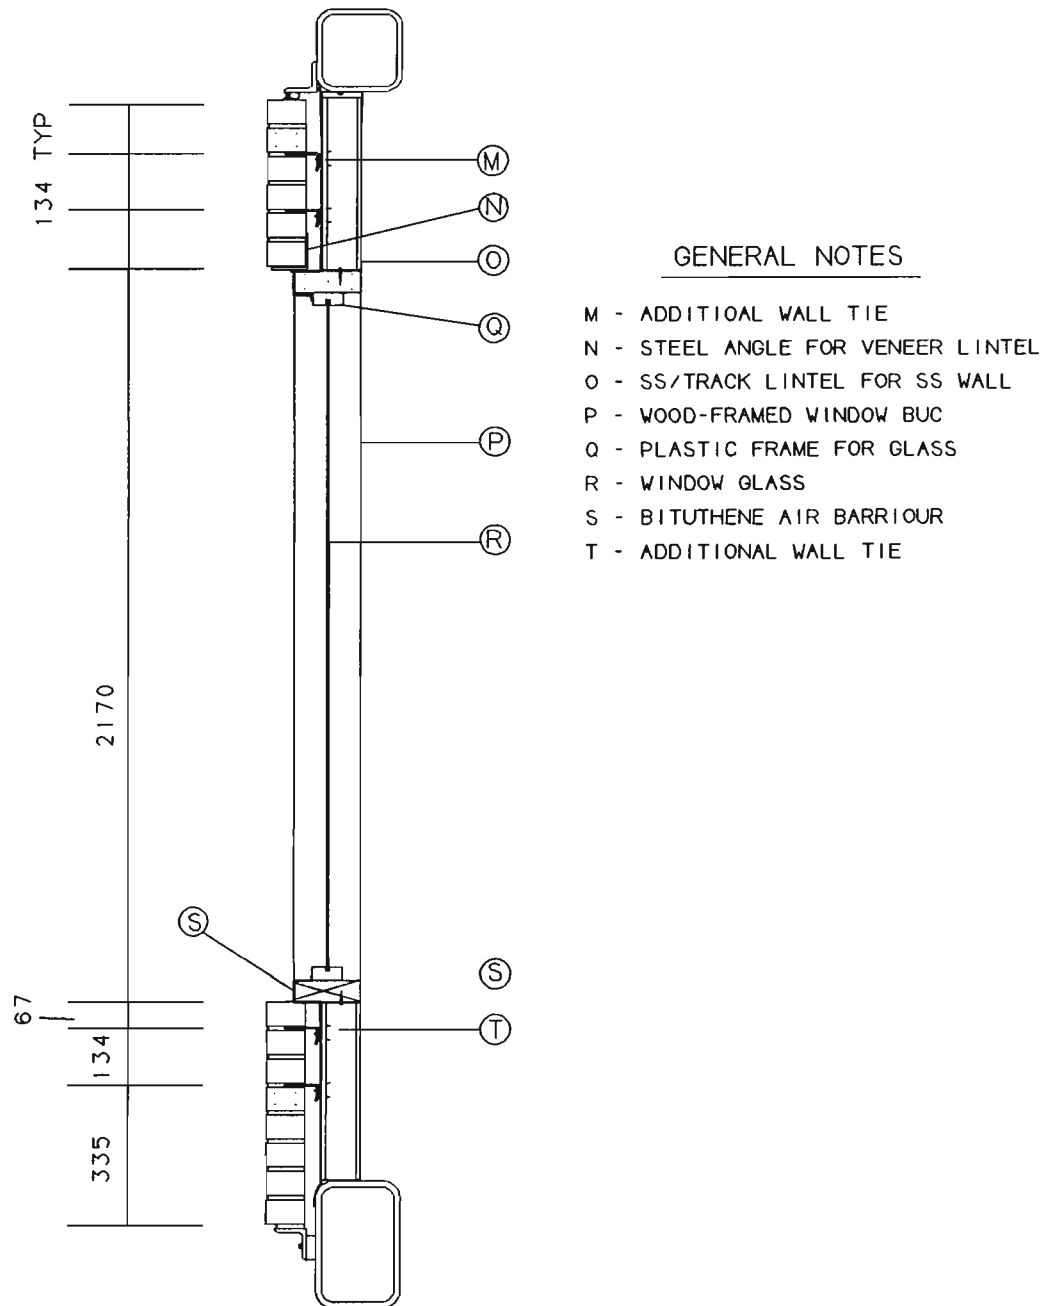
WALL4 DETAILS AND NOTES AT SECTION THROUGH WINDOW OPENING
